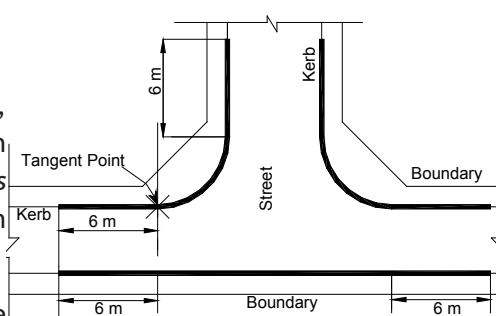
Restricted locations of driveways entry as shown heavy edged lines.
